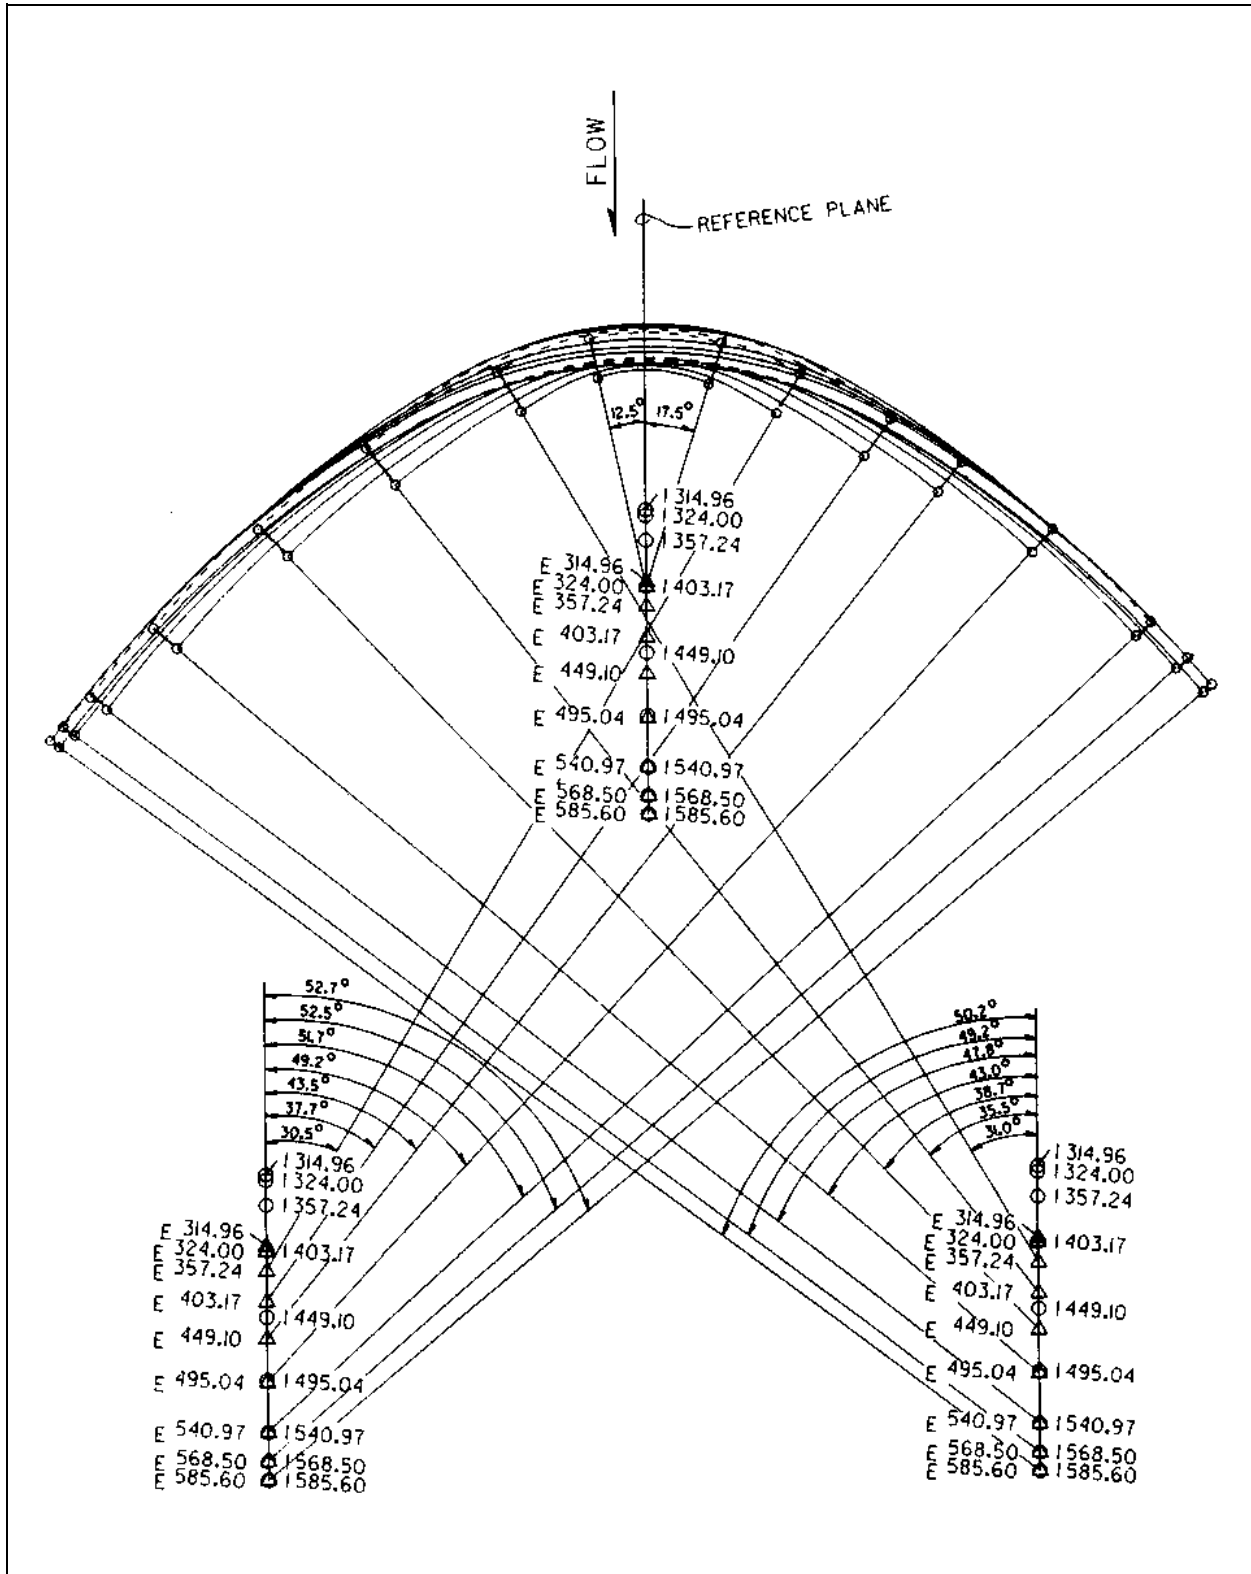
Plan of a three-centered variable-thickness arch dam
